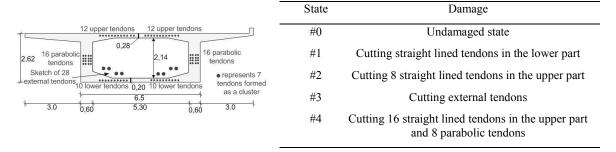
Schematic cross section of the box girder with location of the tendons and the execution of damages in the Champangshiel bridge
